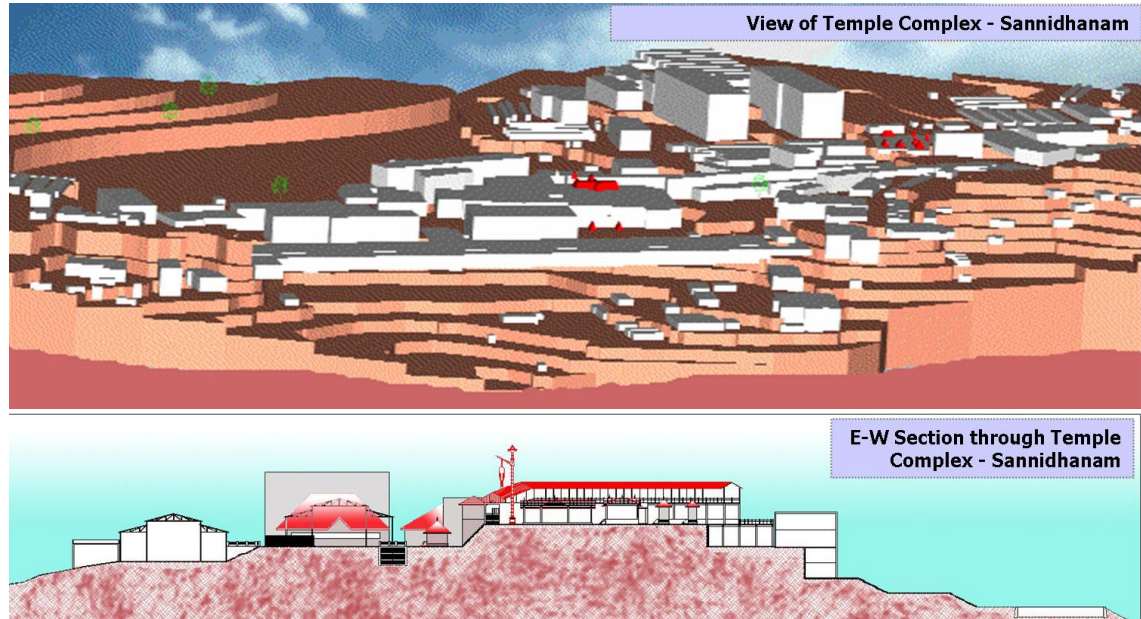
View and Section of Terrain and Buildings at Sannidhanam
